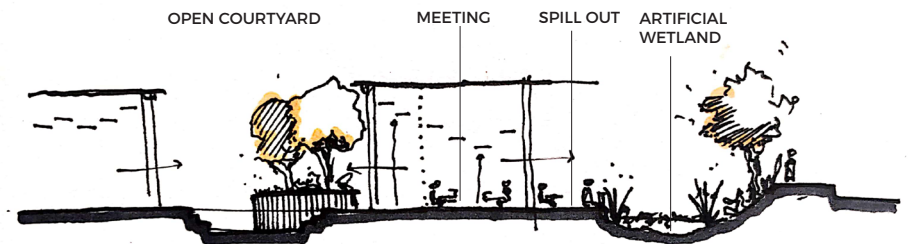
GROUND FLOOR CONCEPTUAL SECTION (AUTHOR 2021)
